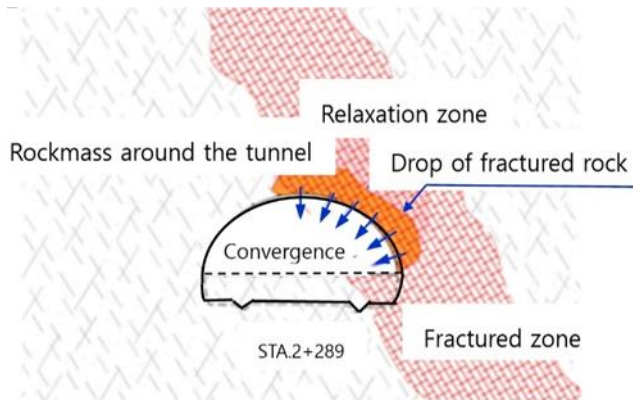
Shape of fractured zone (after tunnel excavation)
